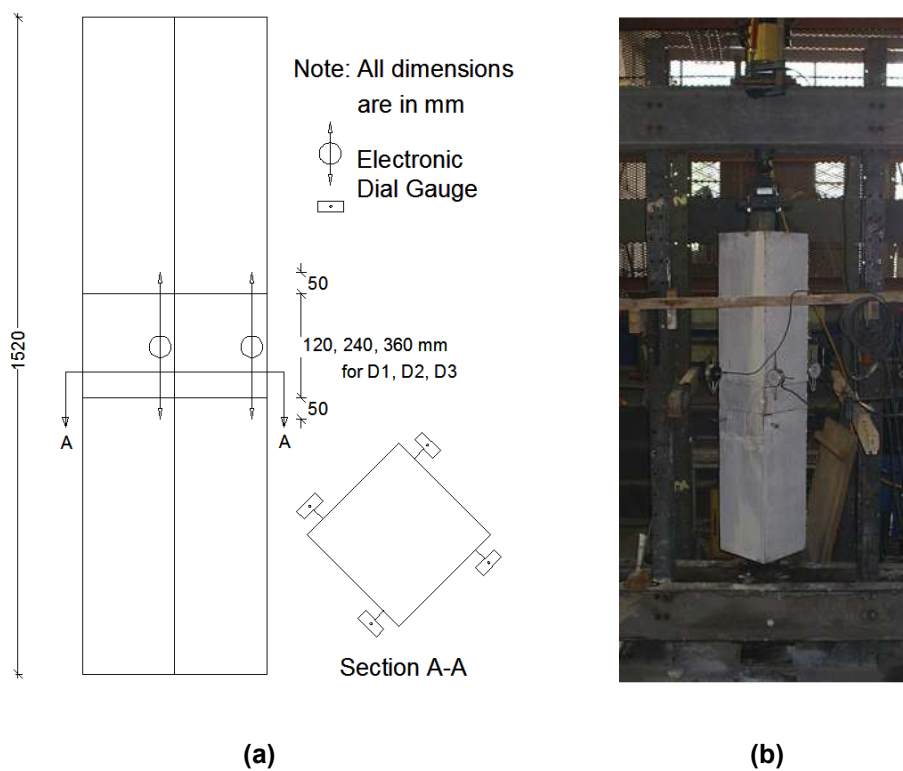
(a) Measurement, (b) Test specimen on the setup
